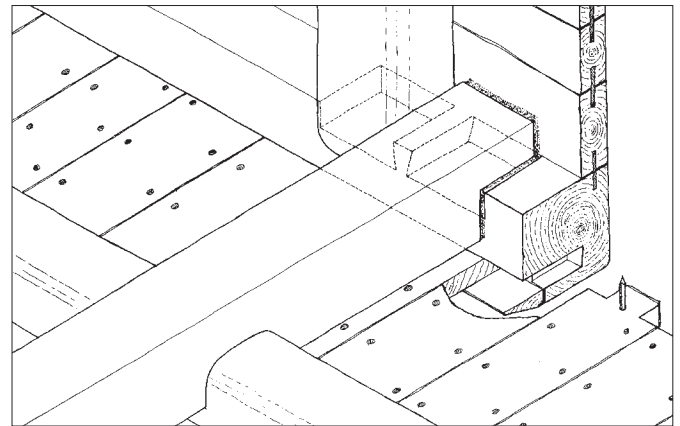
Detail of stringer let into chine beam at bow and stern, Area K caisson, Caesarea (C. J. Brandon).
